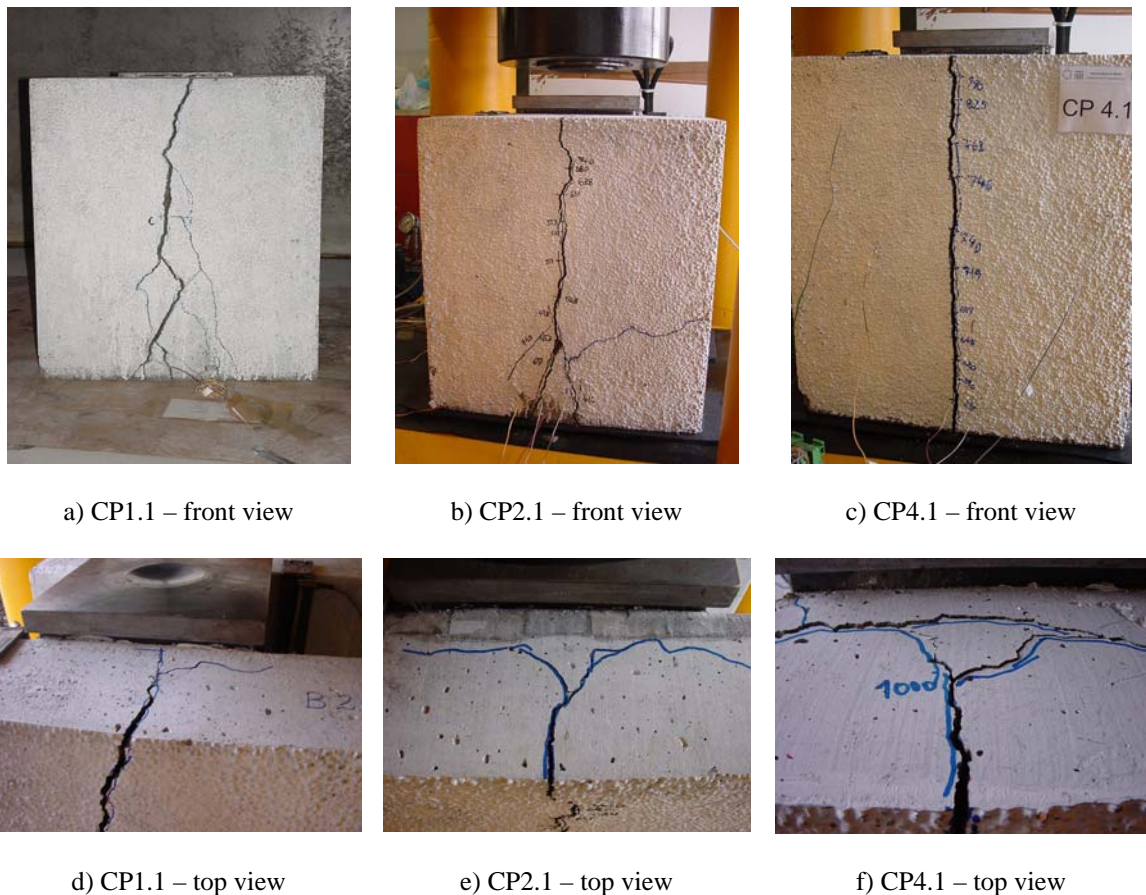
Crack opening on the lightweight concrete slab (Series CP X.1)
